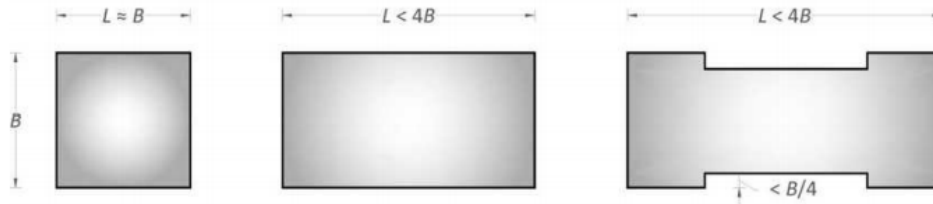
Examples of buildings with regular masonry in plan (Source: Tomazevic,1999)
